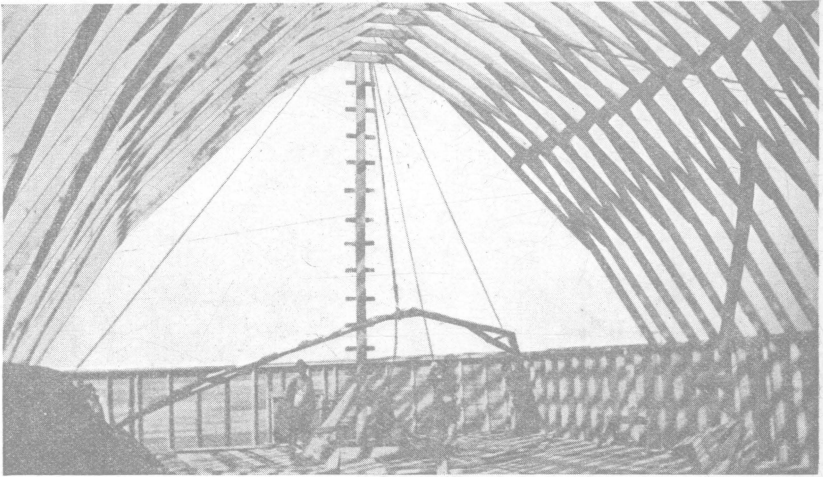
Braced rafter barn in process of building. View inside of hay mow showing method of raising trusses. Another truss ready for erection is lying on the floor. (Gin pole used in raising these trusses is shown on page 8).
